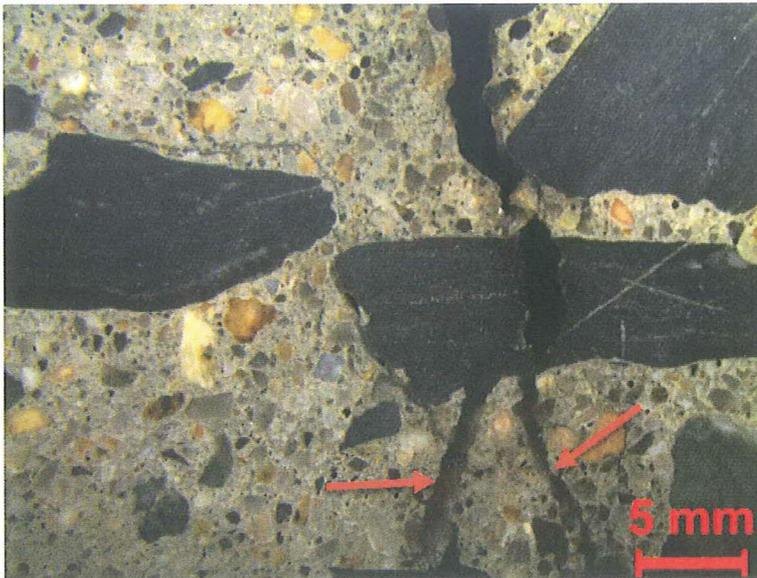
Lapped section of Core 13AB showing branching out of the longitudinal crack. Note the epoxy in the cracks (arrows).
